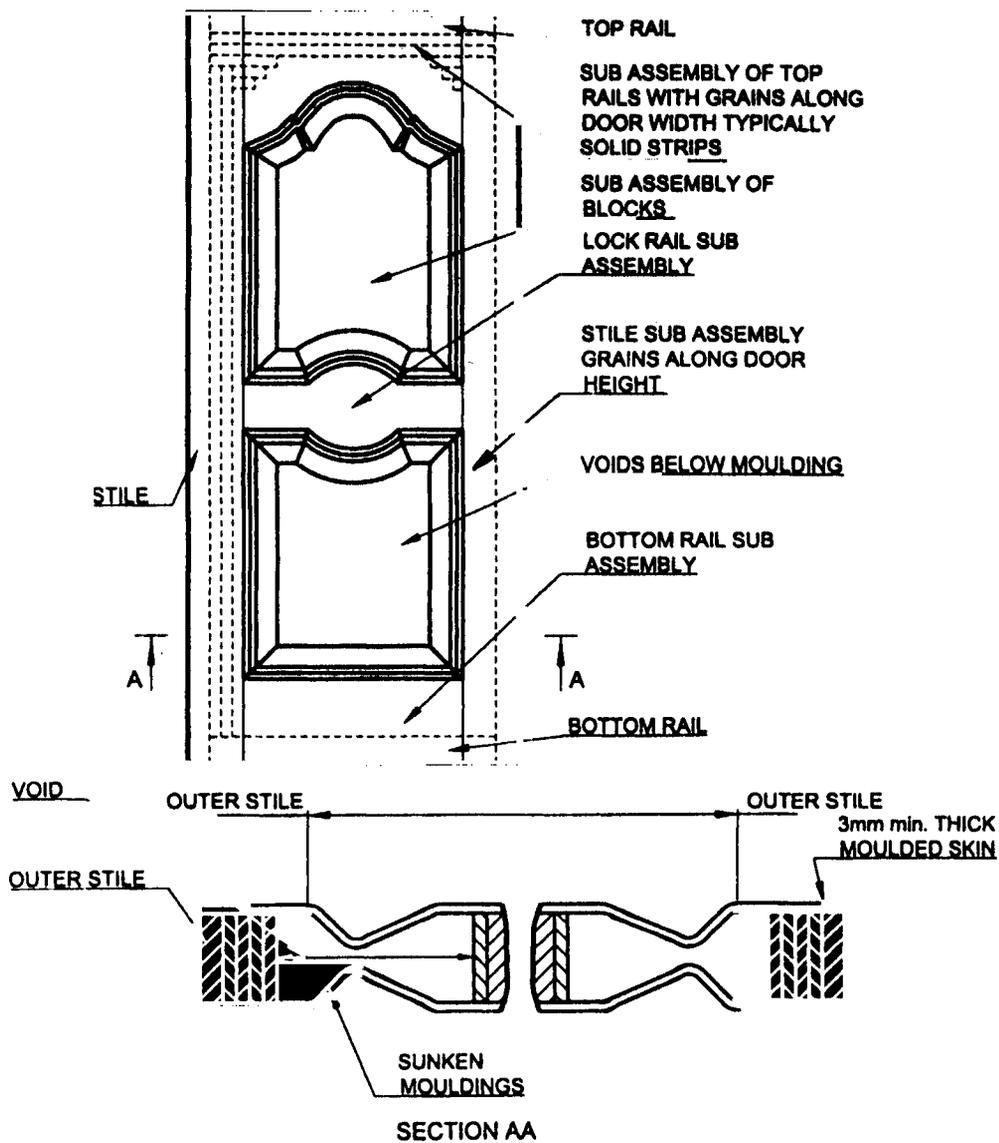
TYPICAL MOULDED RAISED HDF PANEL DOOR
